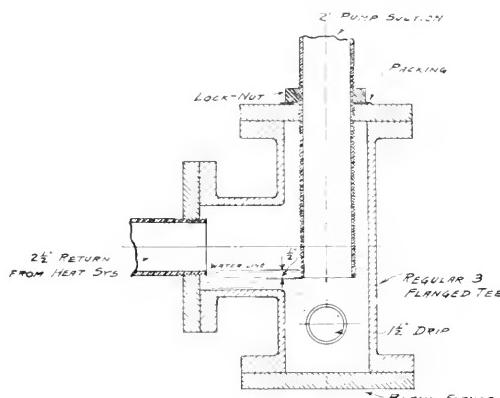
DETAIL OF SECTION T IN PUMP PIT.
